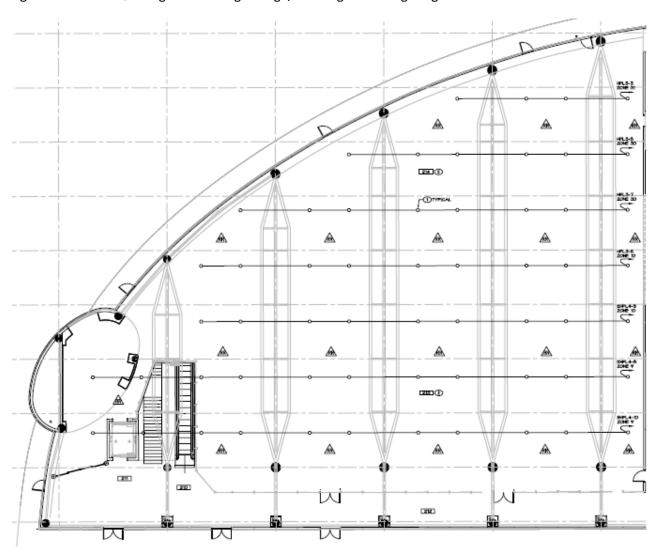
Ticket Queuing and Waiting Lounge/Meeting Rooms Section
